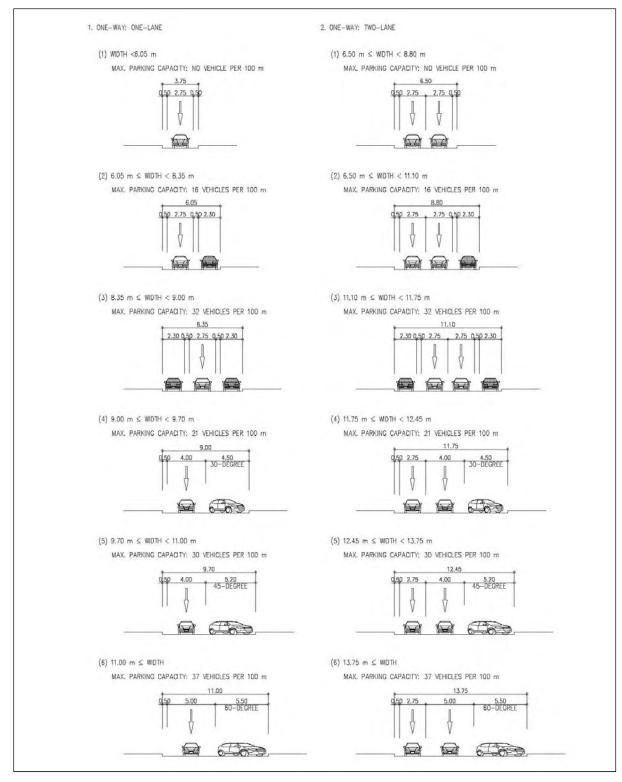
Proposed Typical Cross Section with On-street Parking
